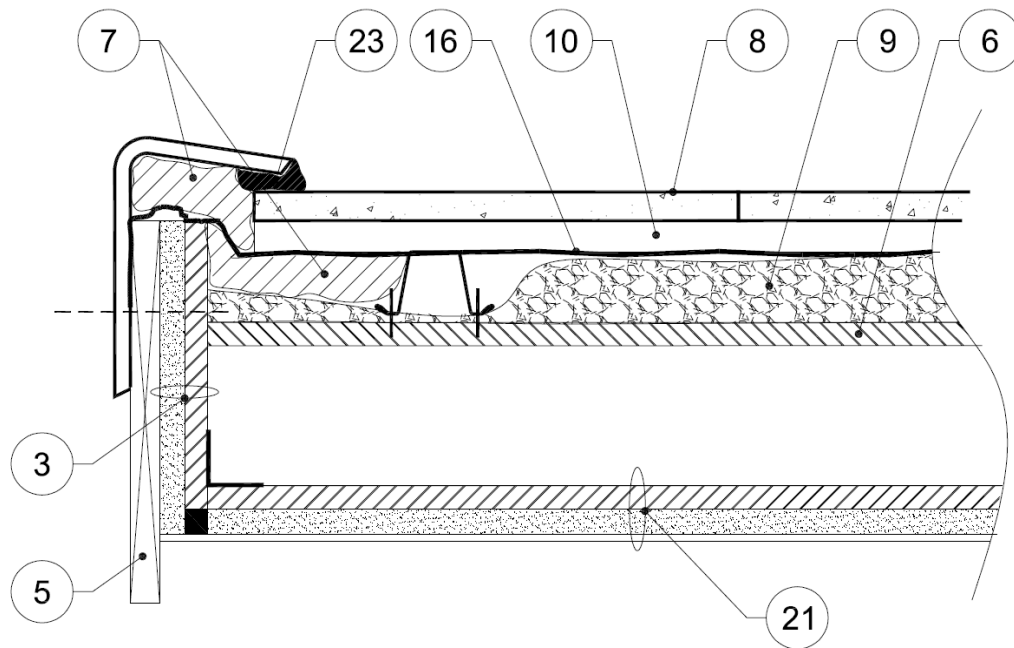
Example of Timber Frame Roof System (Section A-A)
